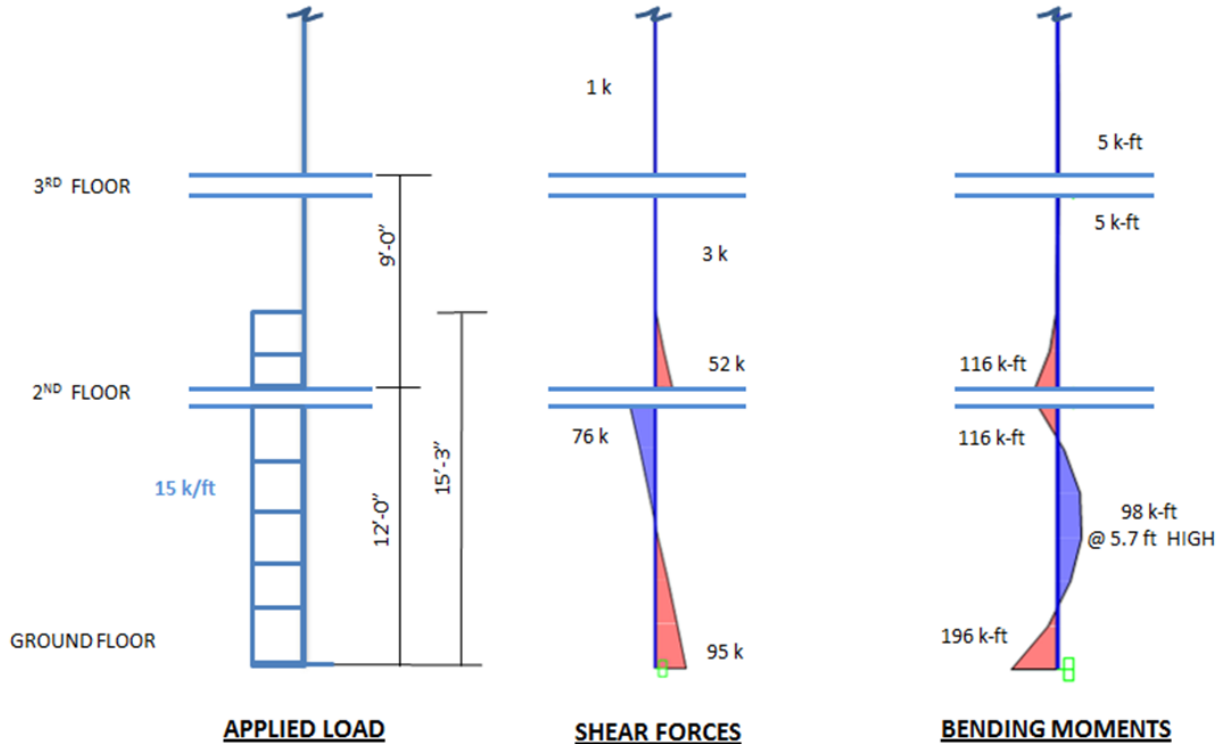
Hydrodynamic loading on exterior wall of Waikiki residential building due to Load Case 2
